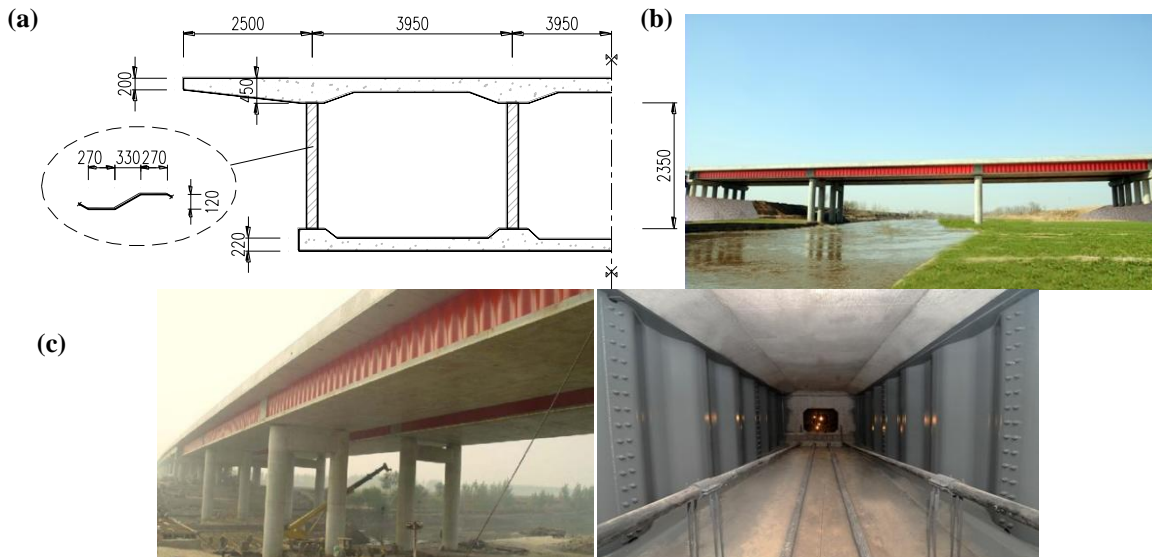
Exemplified bridge structure with corrugated webs completed in China, 2010: (a) cross-section of a box girder with corrugated webs (dimensions in mm), (b) overview of the bridge, (c) details of corrugated steel webs jointing flange plates [2,3]
